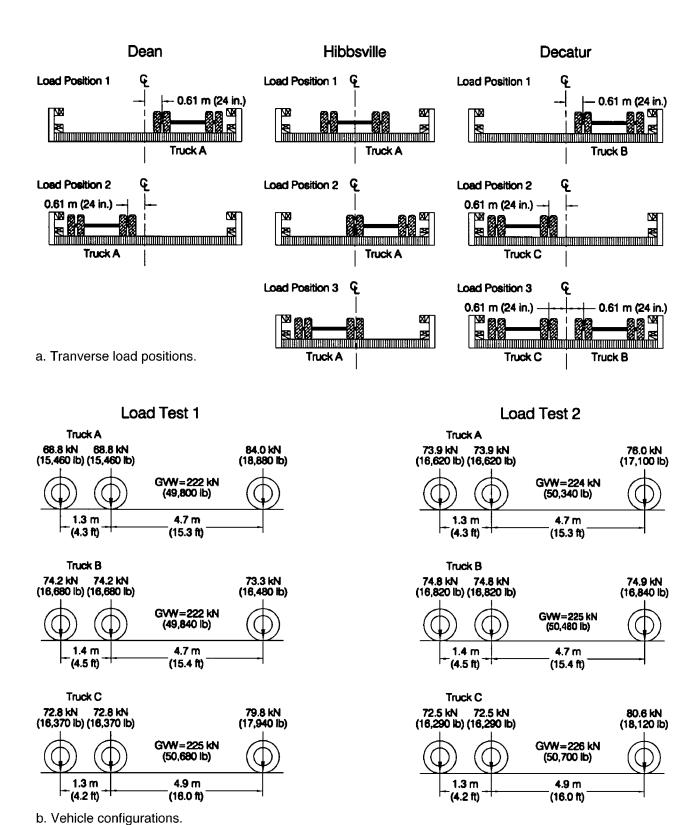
(a) Transverse load positions used for load tests (looking west). Only load position 1 was conducted at the second Hibbsville bridge load test. (b) Test vehicle configurations and axle loads for load test 1 and 2 (right single axle is vehicle front). The transverse vehicle track width, measured center-to-center of the rear tires, was 1.8 m (6 ft).
